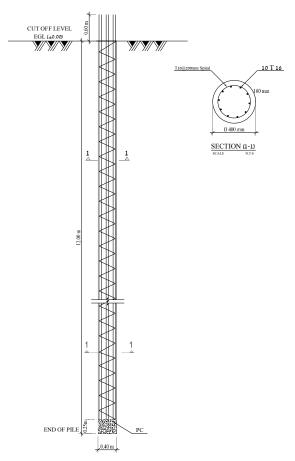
Schematic diagrams of piles cross section and length for site S-01, Baridhara
